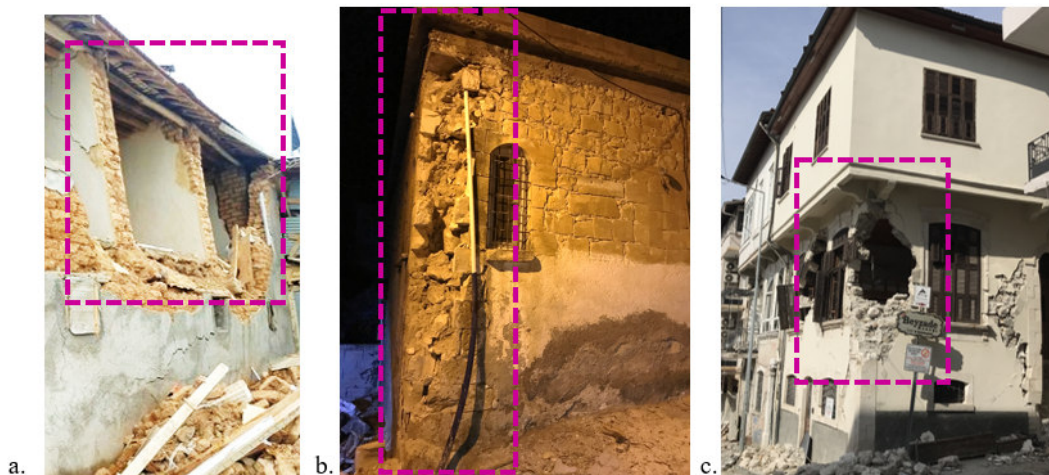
a. Wall-to-wall junction failure b. Corner failure in one-storey building c. Partial collapse due to corner and in-plane damages
